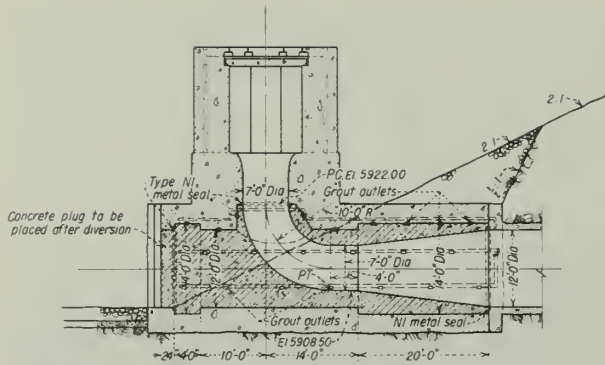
Detail of a concrete plug in an auxiliary diversion conduit. From drawing 526-D-146.
